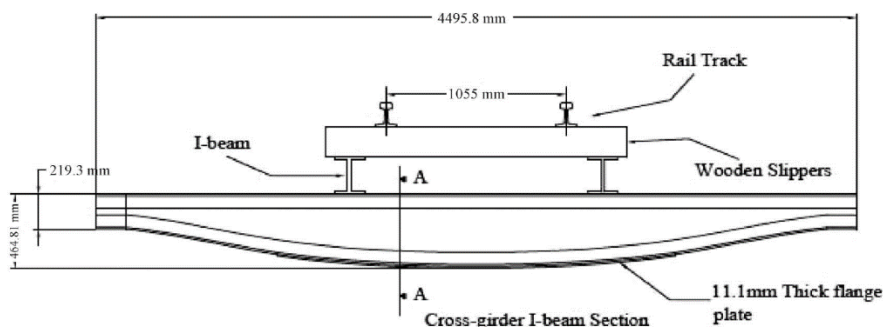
Cross section taken through the cross beam on the Kalbaskraal Bridge
